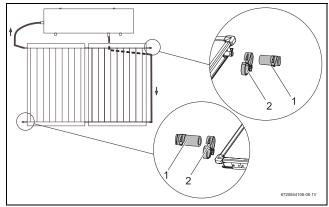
Hose clip with locking ring and pre-assembled dummy plug
